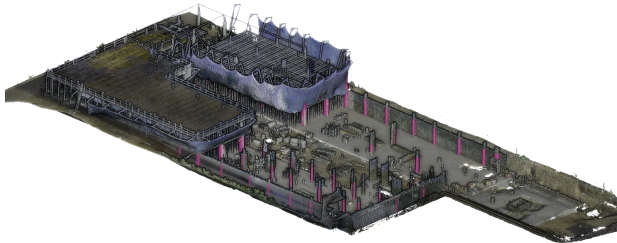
Visualization of columns detected on a construction site. The detected columns are marked in pink.
